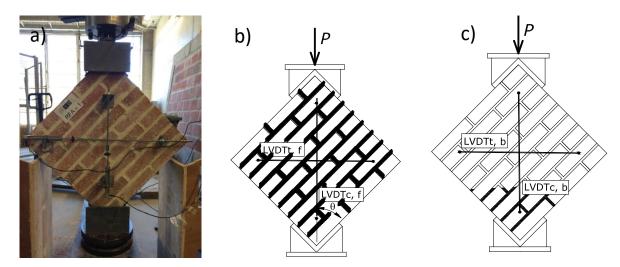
Diagonal compression test: a) set-up, b) instrumentation of the front face; c) instrumentation of the back face.
